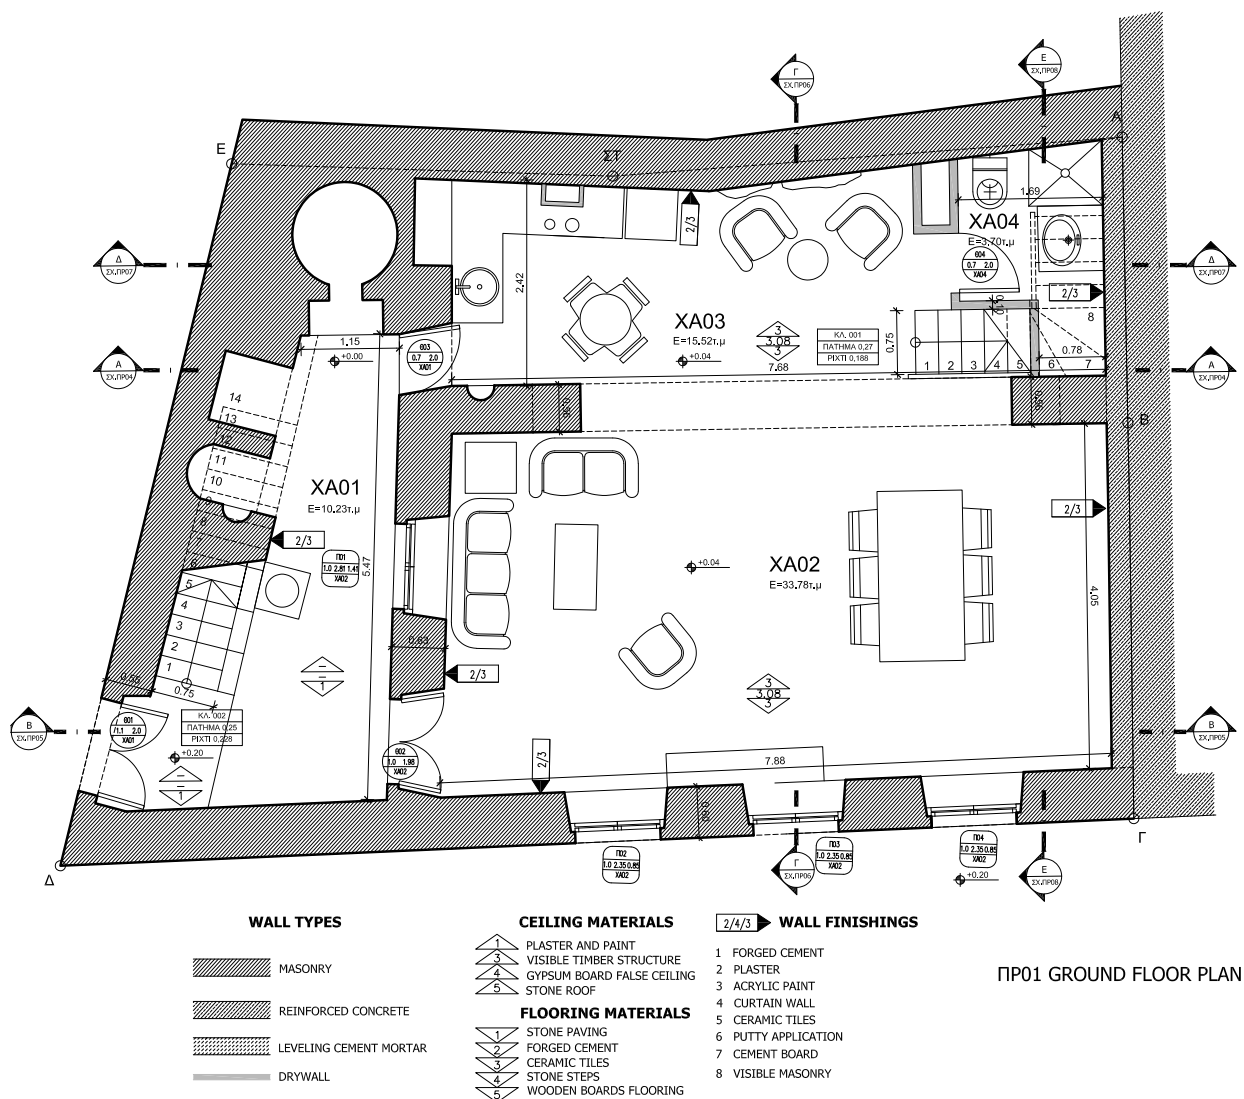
Ground floor plan of the proposal for the restoration of the building.
